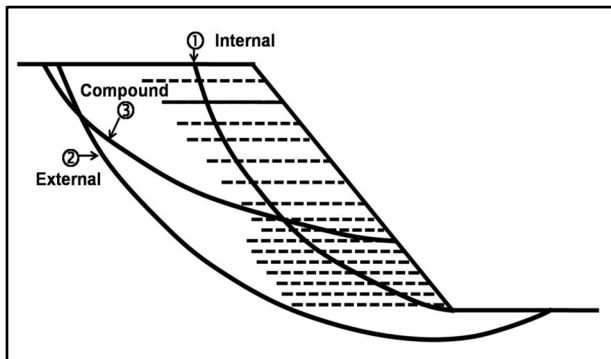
Failure modes for reinforced soil slopes (FHWA) [14]
